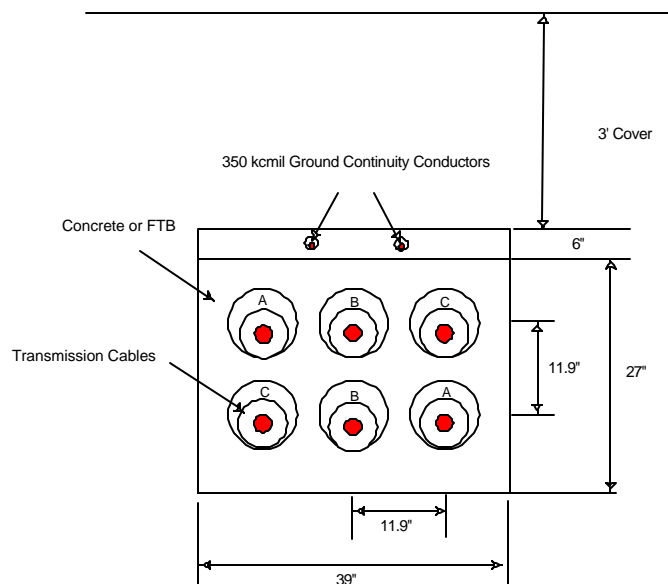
Concrete Encased Duct Bank Cross Section, 3' Duct Bank Cover
